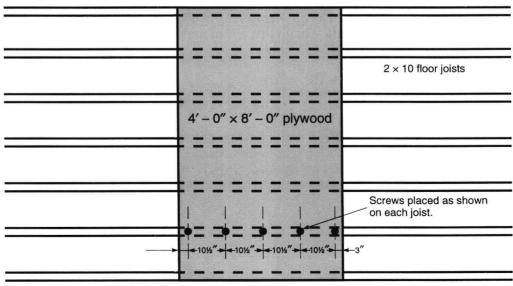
Screw placement for a plywood subfloor. Note that placement for only one joist is shown. Screws must be placed in each joist.
